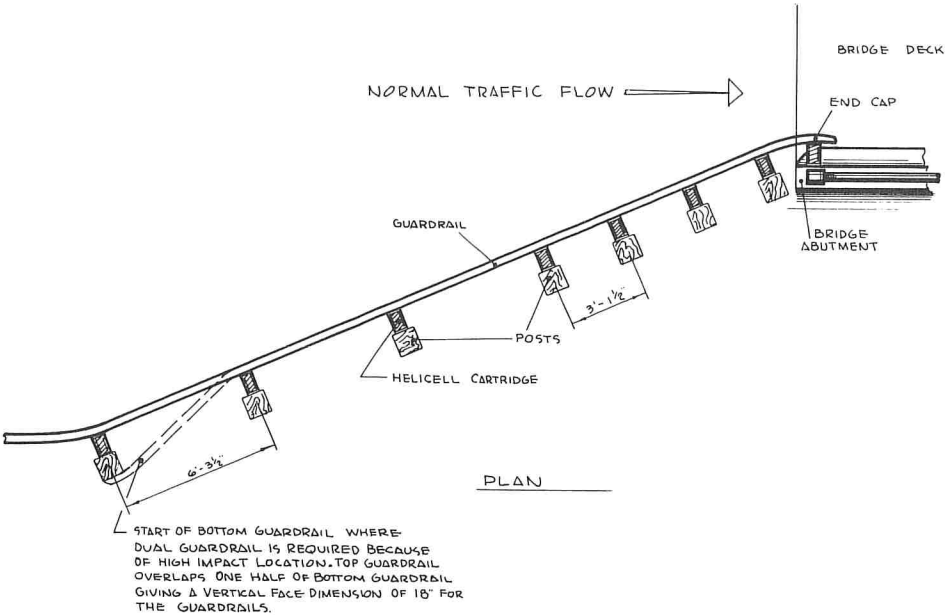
Guardrail protection at bridge approach using helicell cartridge backup.
